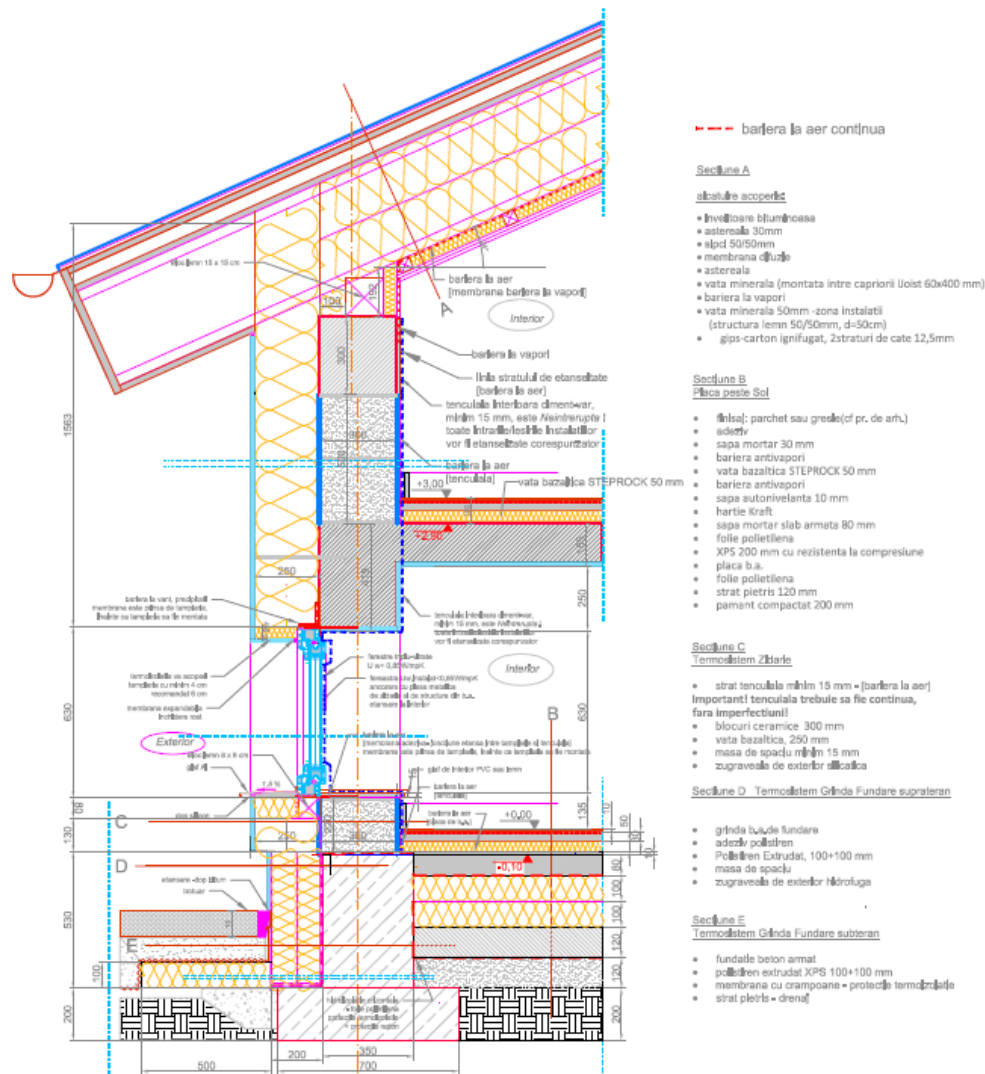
Detail for renovation of mixed reinforced concrete framework and light-wave concrete walls
